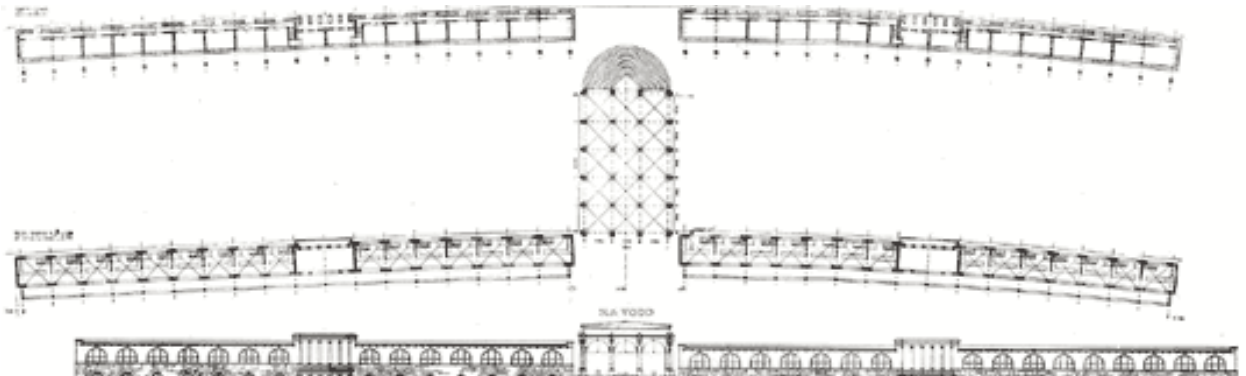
Ljubljana open market (1939-1942): ground-floor plans and elevation views, segment of the project done by Jože Plečnik ("Jože Plečnik - Ljubljanska tržnica, Ljubljana, Trgovska stavba")
